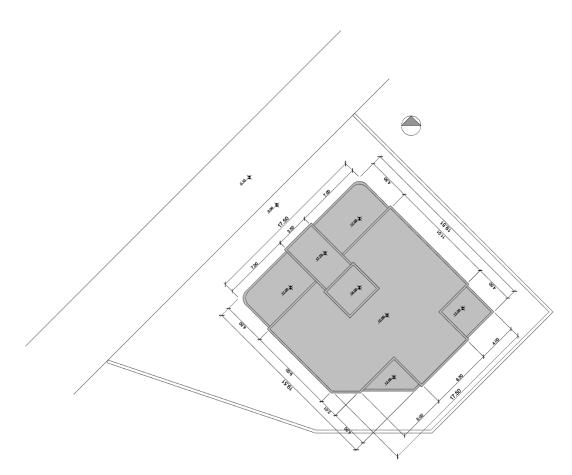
Building orientation in Karakol, Famagusta (on Site Plan) (by Author).
